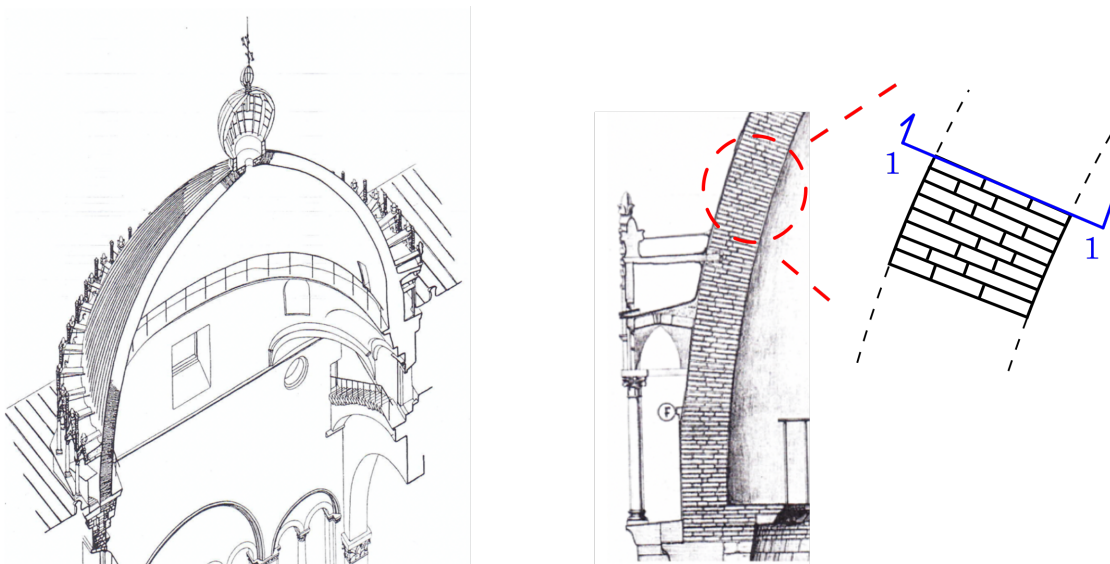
Typical internal brick arrangement in masonry domes (figure adapted from [Sanpaolesi, 1959]).
